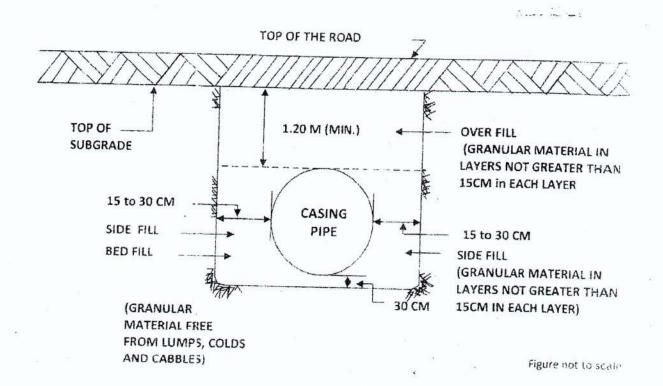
INSTALLATION OF CASING PIPE FOR CROSSING THE ROAD
